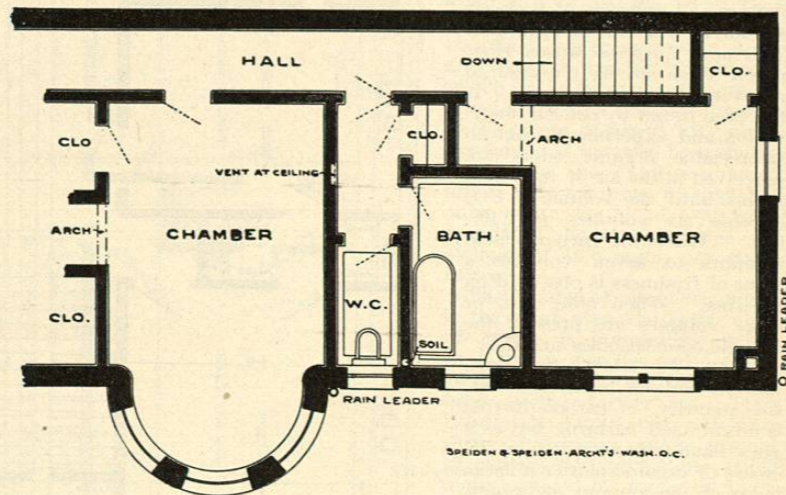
Second-Story Plan of a Corner House Showing Location of Bath-Rooms and Water-Closets.
